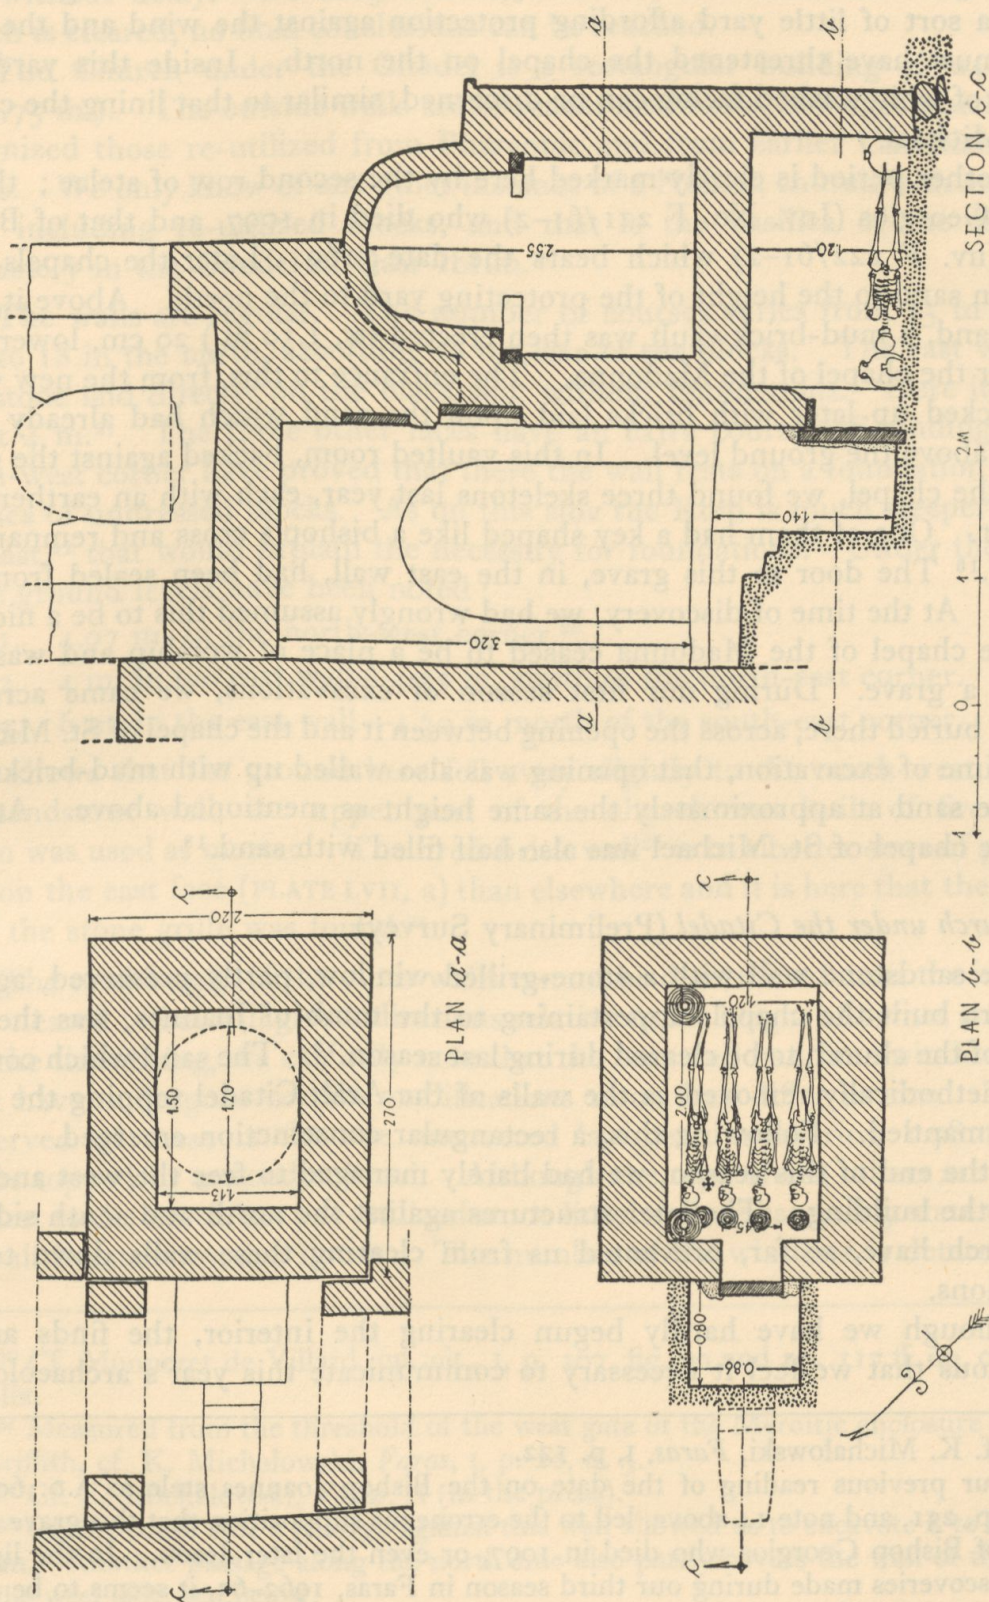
PLANS AND EAST-WEST SECTION OF THE TOMB OF JOANNES
